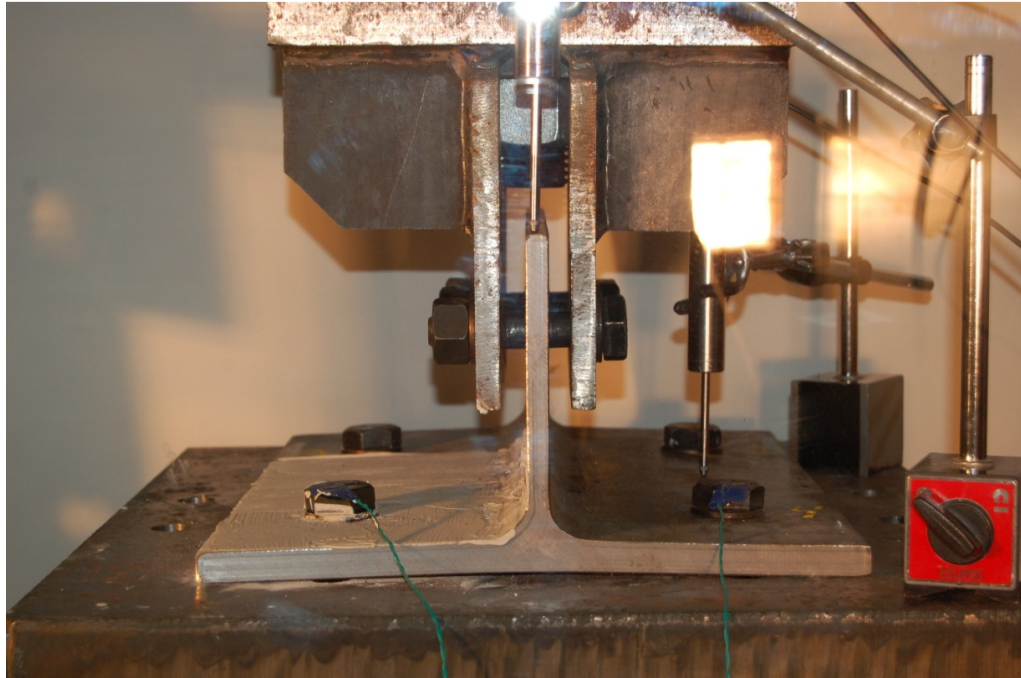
Deformed Shape for Specimen 2.5b at 100 kips Applied Load.
